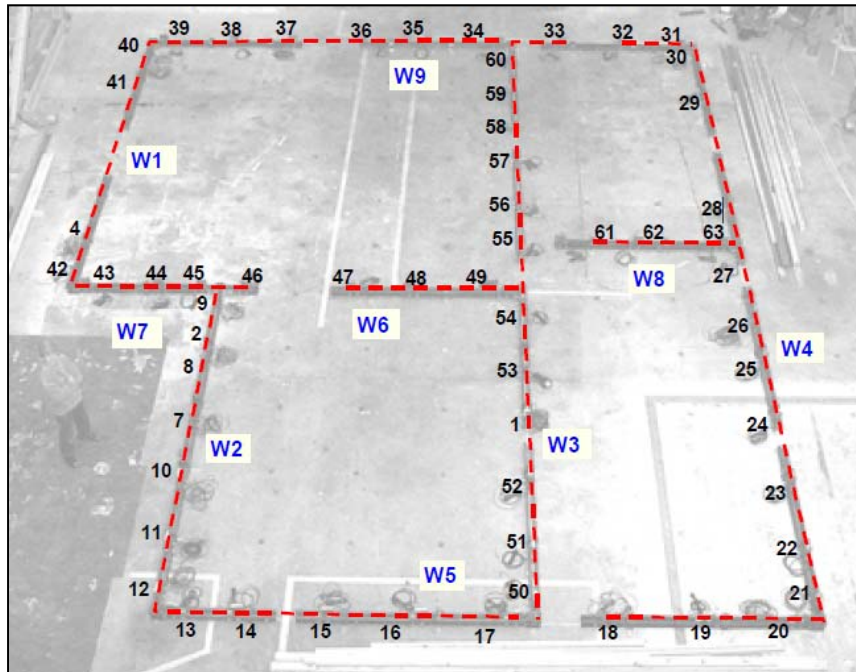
Anchor Bolt and Load Sensor Placement (Paevere 2002)
